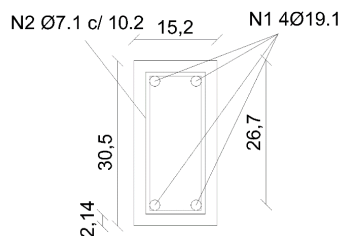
S1 to S7 beams cross section (dimensions in cm and bars diameter in mm).
